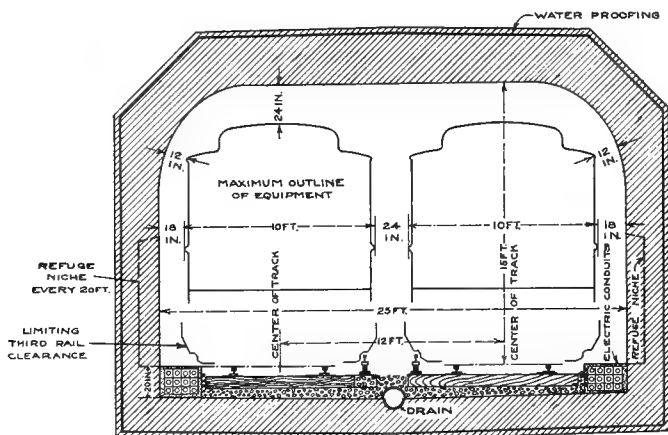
TYPICAL ARCH ROOF SECTION OF RAPID TRANSIT TUNNEL.
